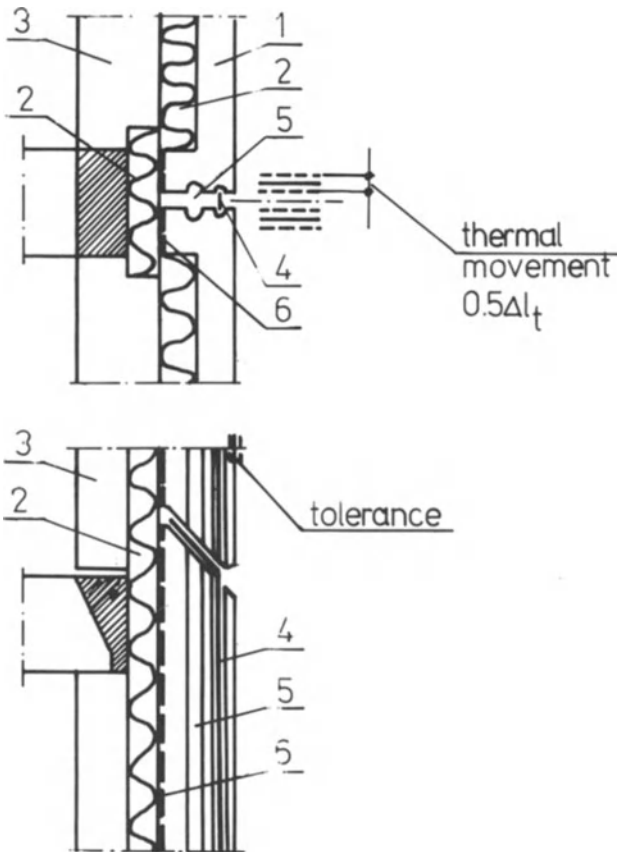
"Open joint" in large-panel sandwich wall 1. external concrete leaf; 2. thermal insulation; 3. internal structural leaf; 4. neopren strip to impede direct rainwater access; 5. decompression channel; 6. air tightness screen
